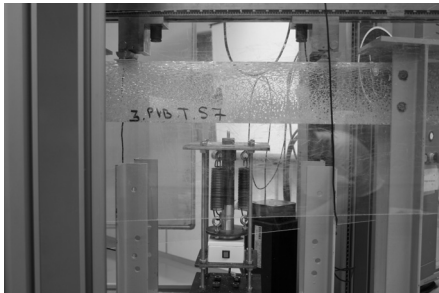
Typical model level II damage in 3.PVB.T specimen.
